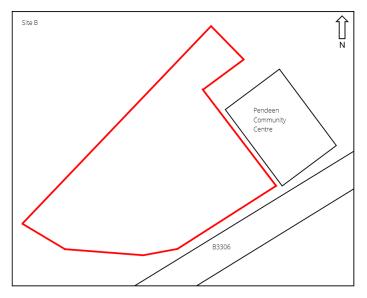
Current Site Layout for the preferred site option (Site B)
